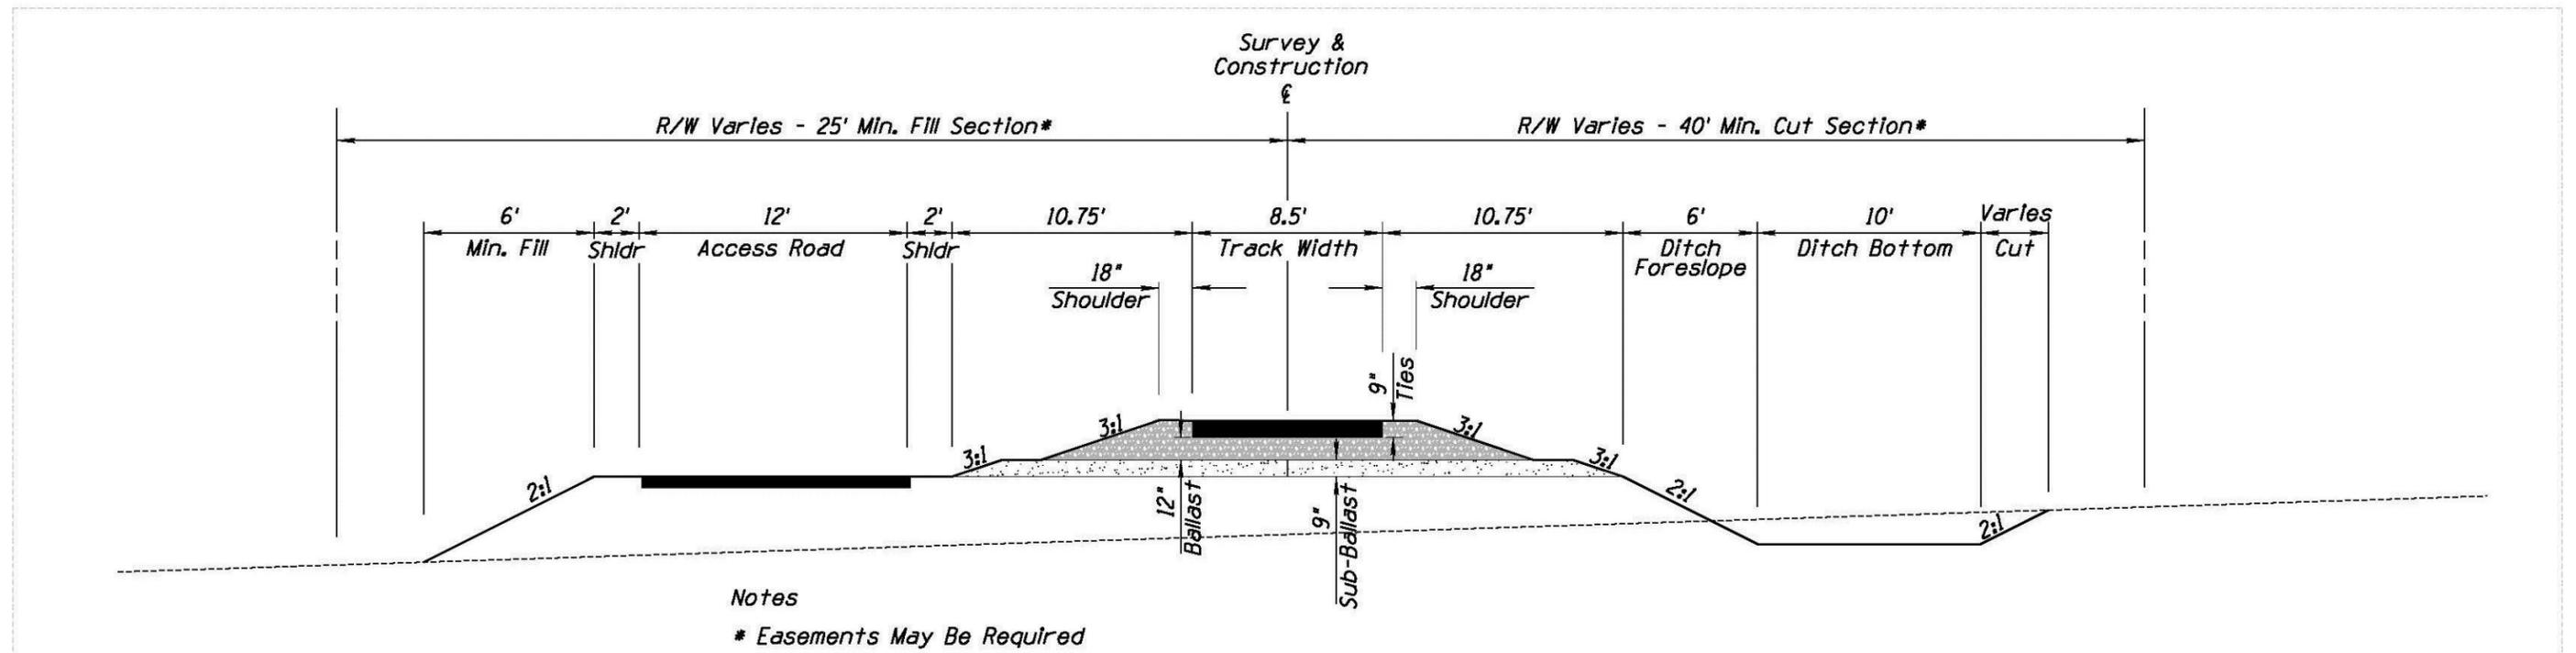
ROW Typical Cross-section (single-track) with Access Road
